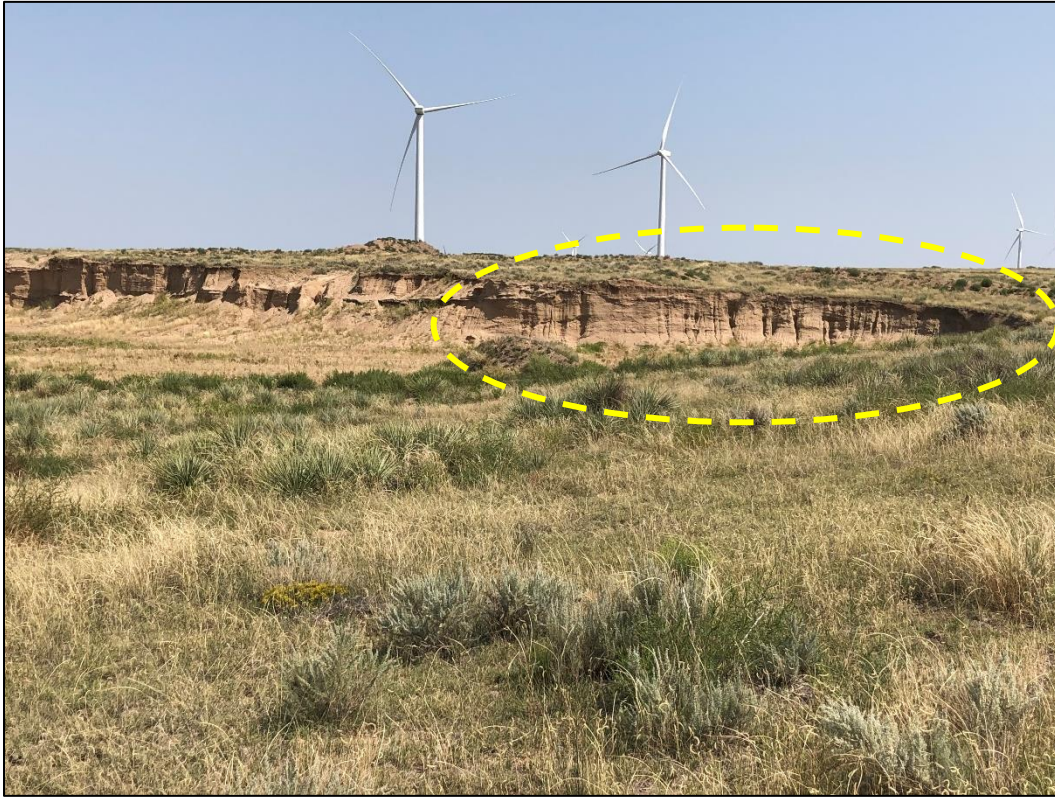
View looking west across northern portion of pit located north of access road, showing material stockpiled in this area.
